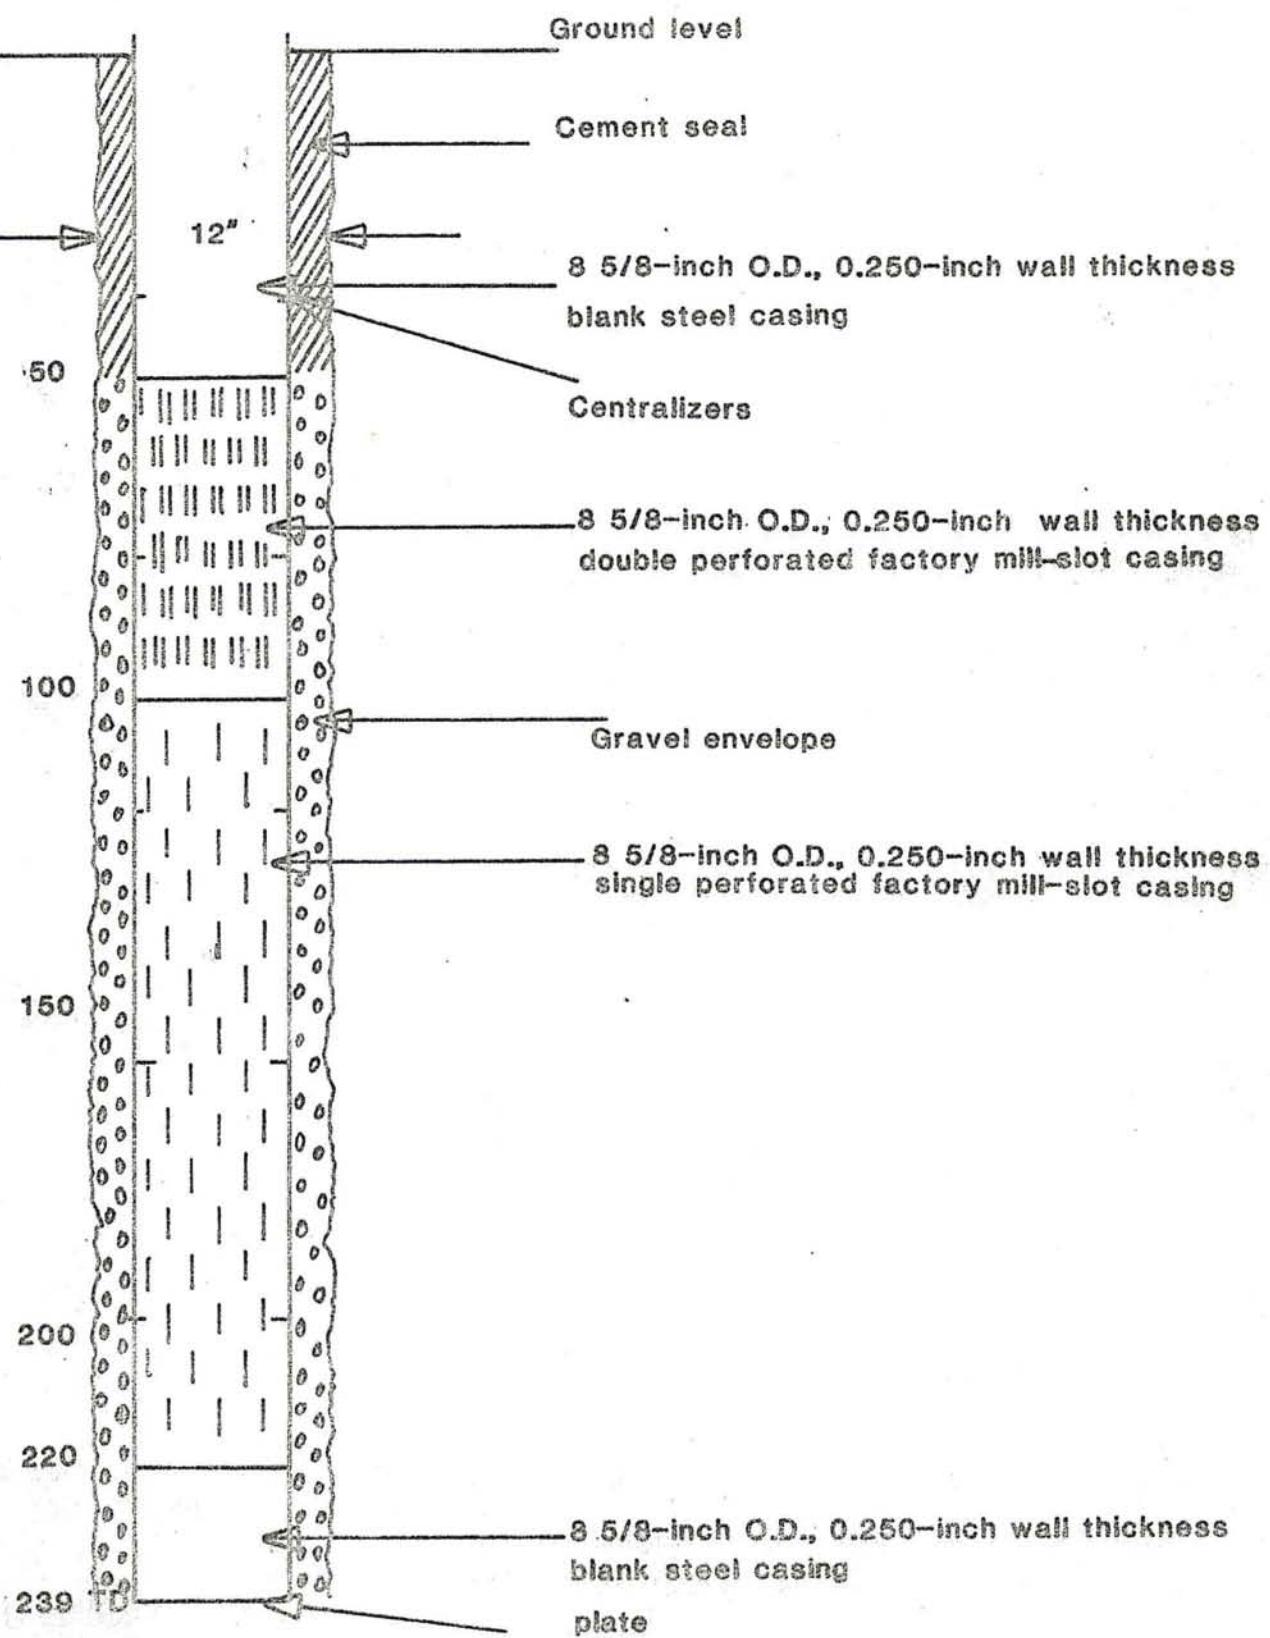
Elko Junior High School Geothermal Observation Well Construction Diagram.
